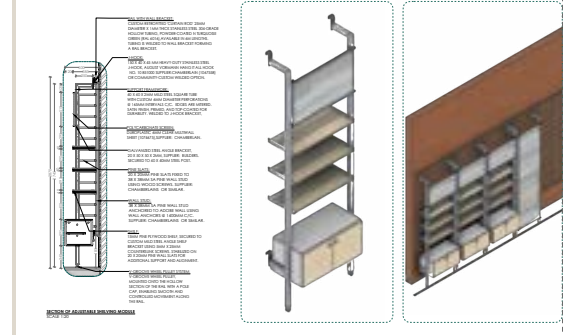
WALL MOUNTED RAIL SYSTEM
